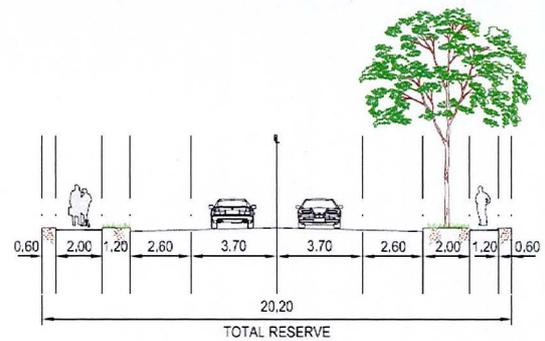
Road Type 3: Collector Road (North-South) with Shared Path (Riverside Dr Extension)
